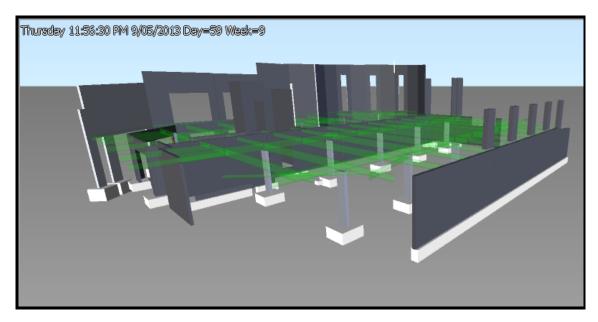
Building Approval Stage (Viewpoint 2) - Works Complete Week 9
